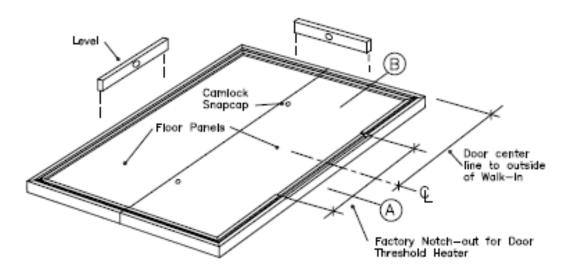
FLOOR ASSEMBLY - EXAMPLE ONLY
